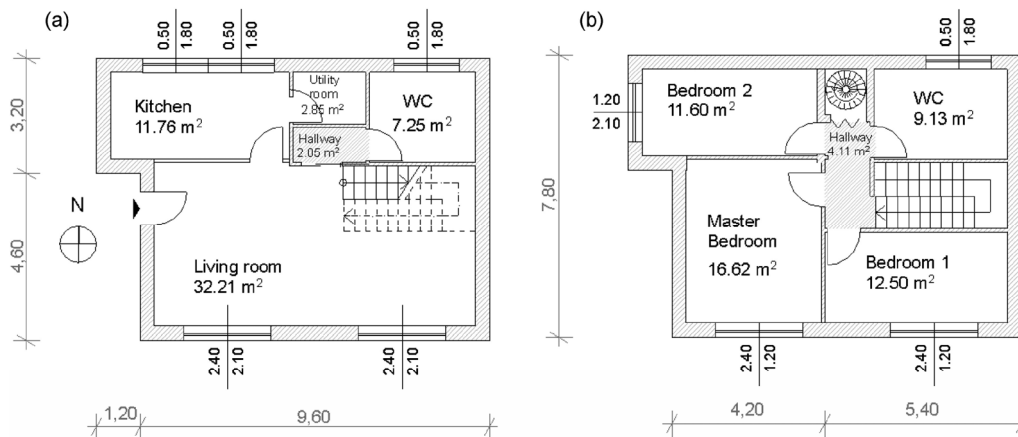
Detached house plans: (a) ground floor and (b) first floor
